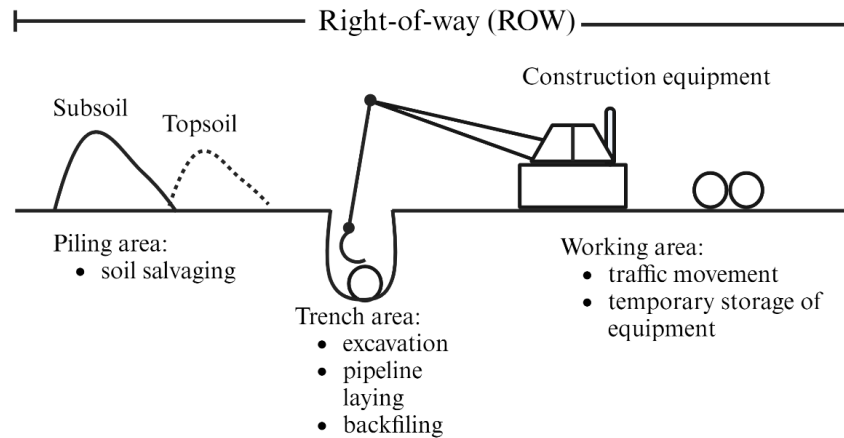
1 Typical zones of an underground pipeline right-of-way (ROW).
